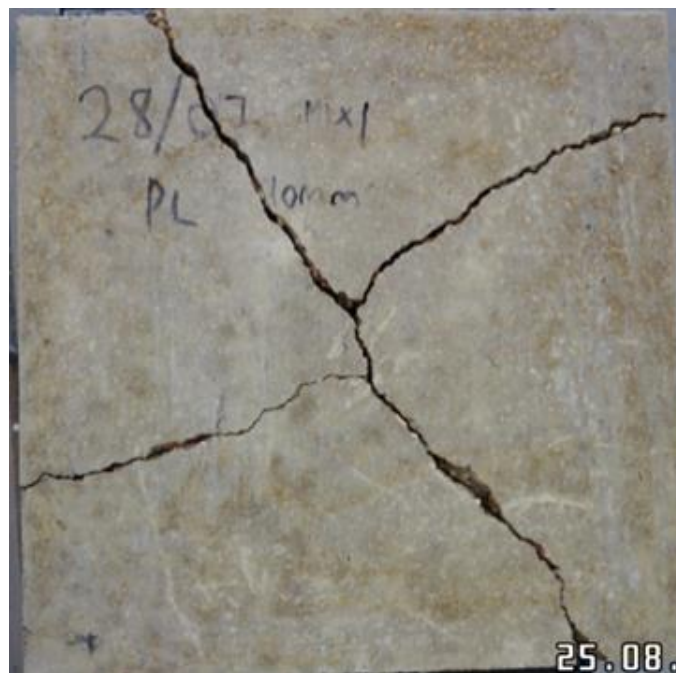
Cracks of plain concrete slab of 10 mm mix
